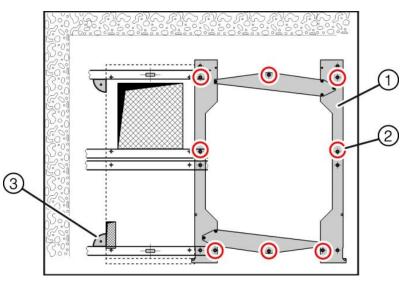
Applied drilling template, arrangement for 1000 mm panel width as an example
